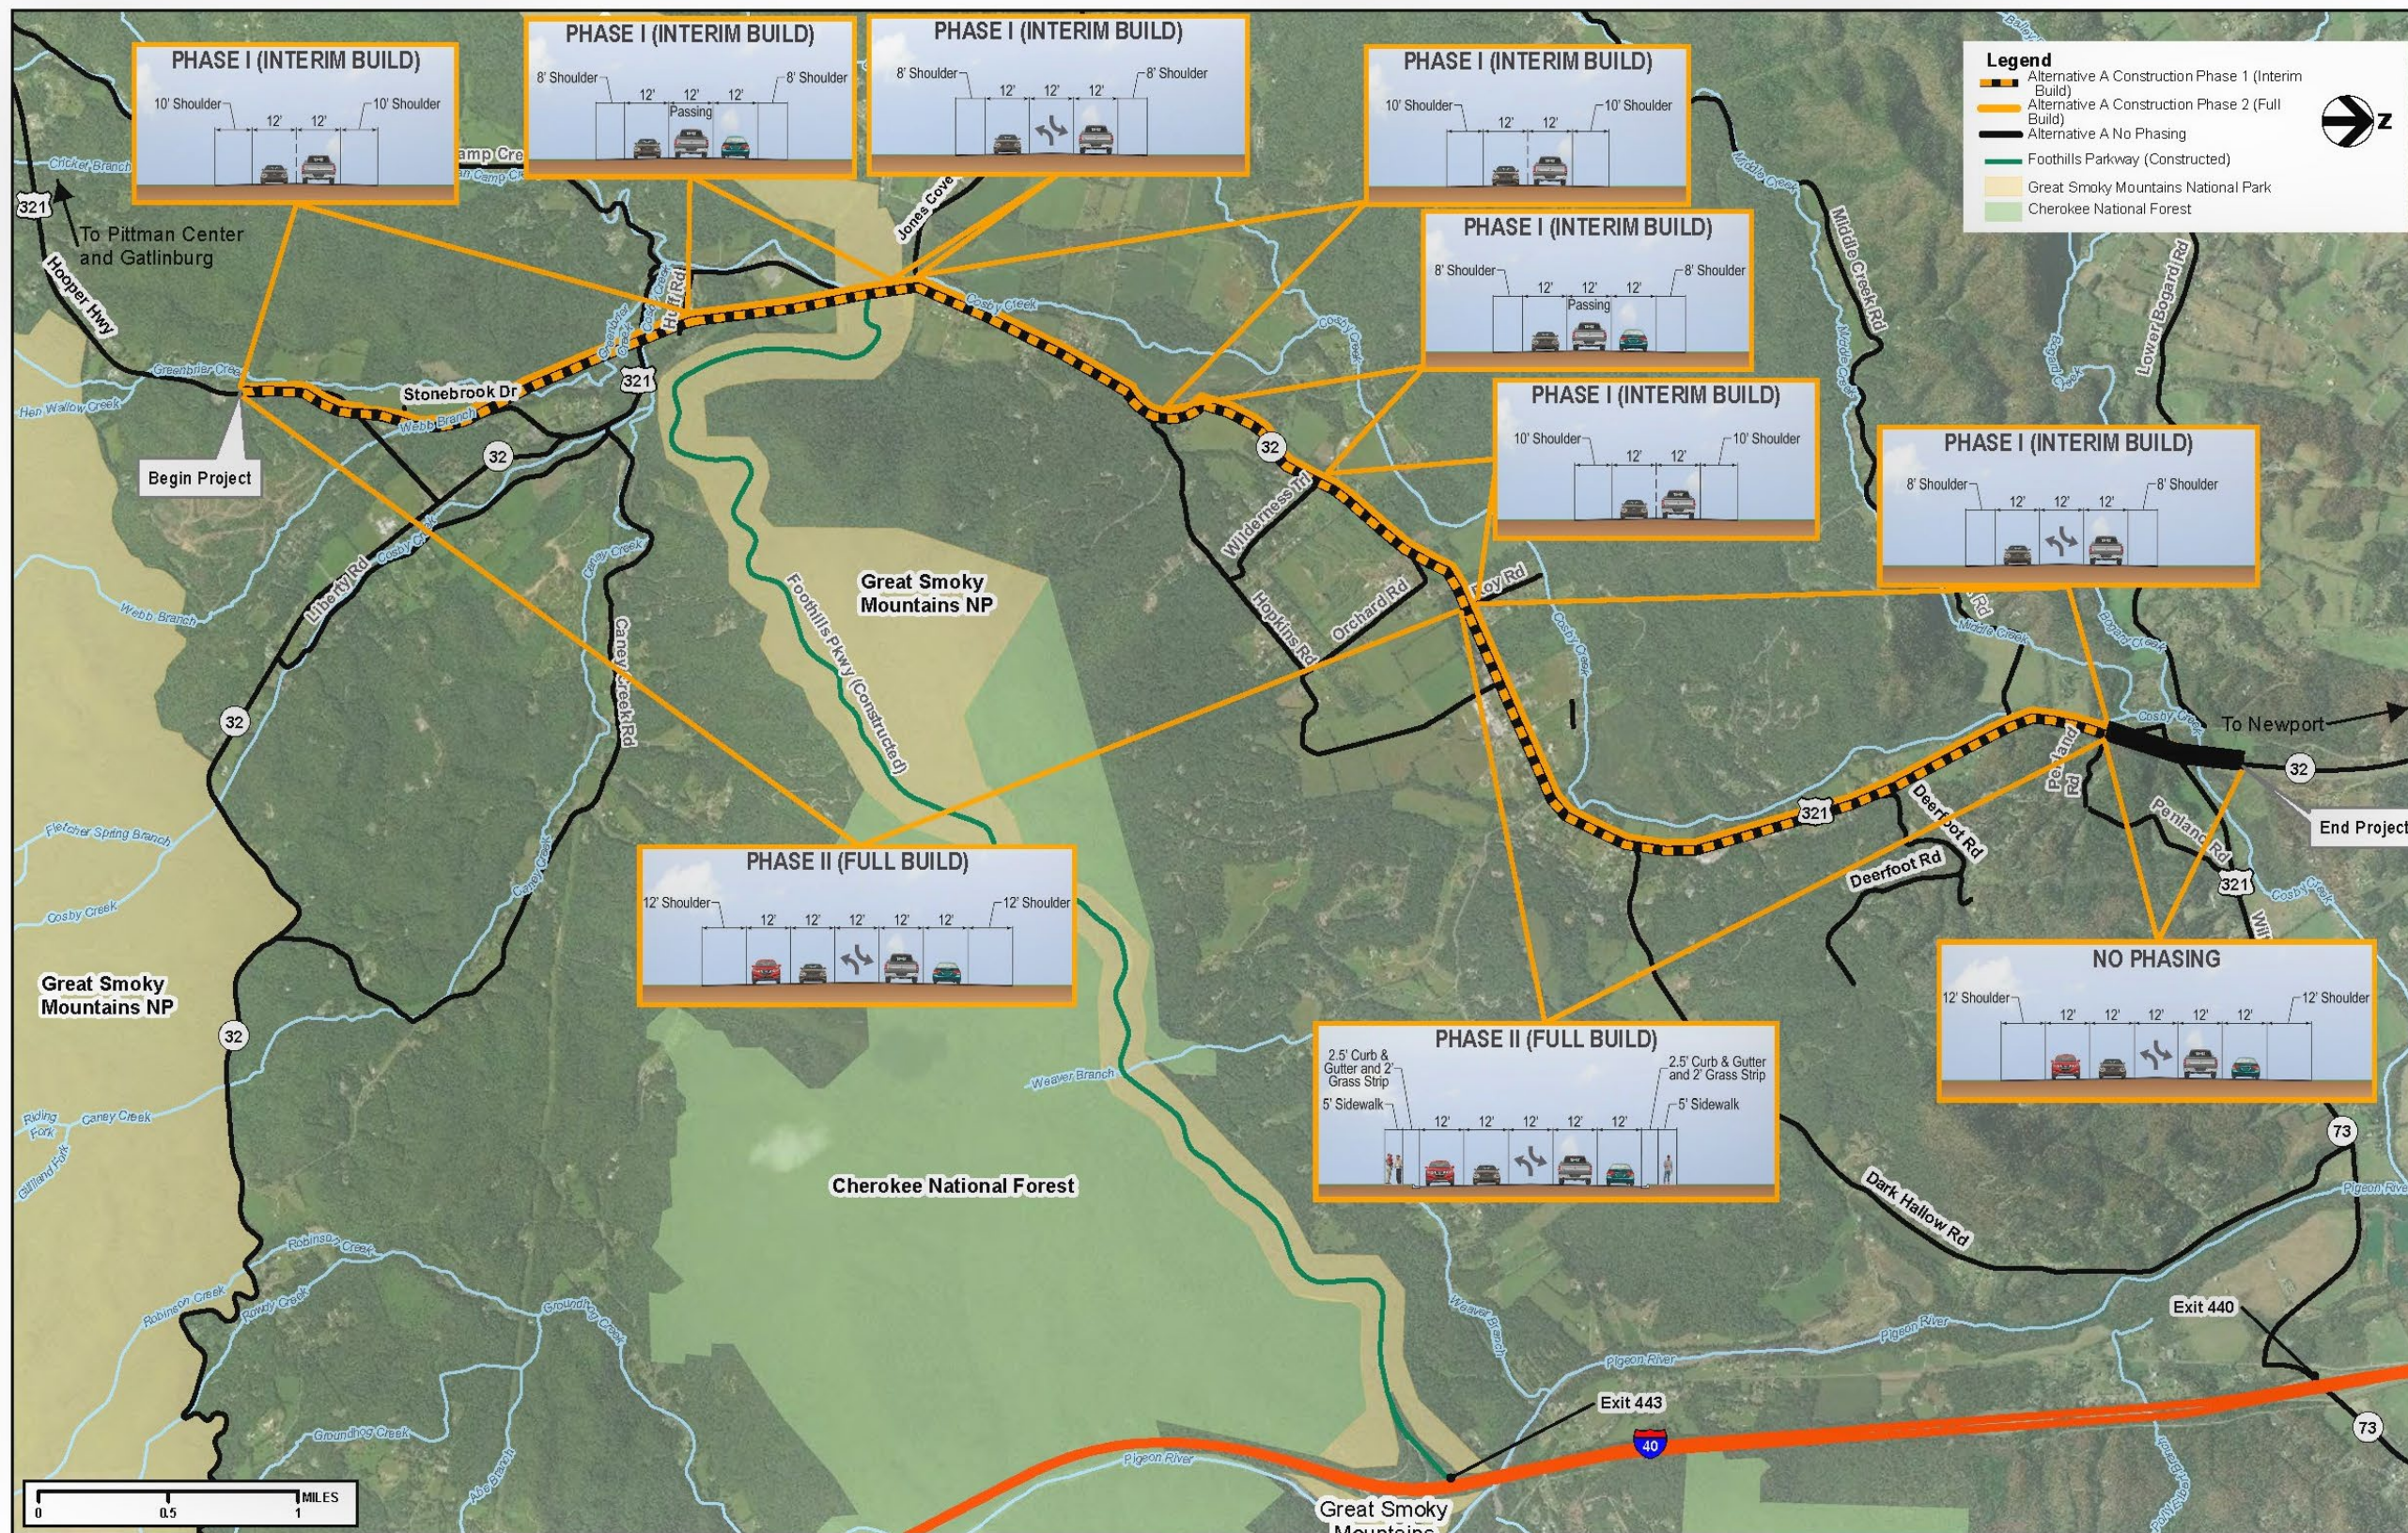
Proposed Roadway Typical Sections: Alternative A
